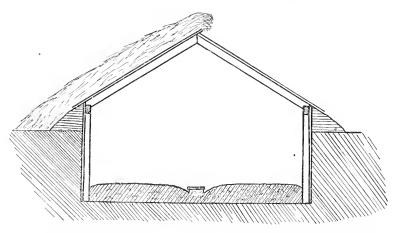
Cross-section of a mushroom house. The house is constructed of wood and banked up with earth, and the earth covered with hay or straw.
